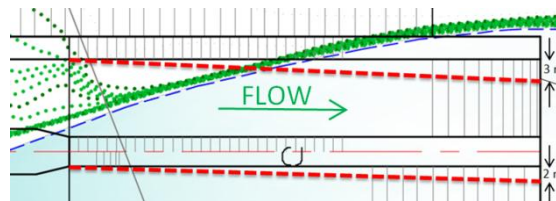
The width of the left abutment and the left-most divide wall was increased by 3m and 2m, respectively.
